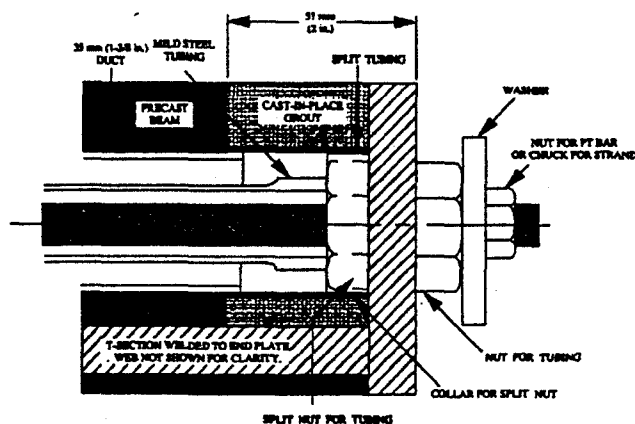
Details of breakout in Specimen L-P-Z4 C
